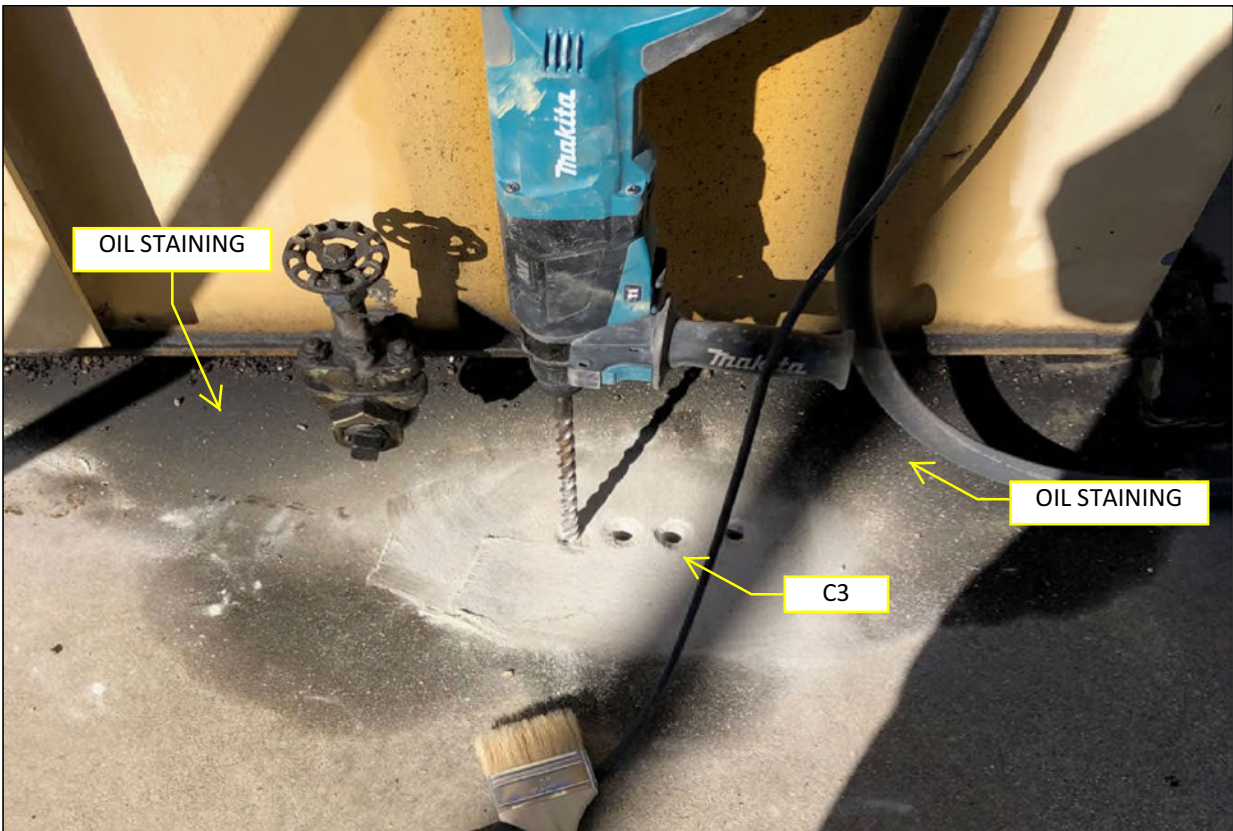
COMPOSITE CONCRETE SAMPLE LOCATION C3 SHOWING OIL STAINING
